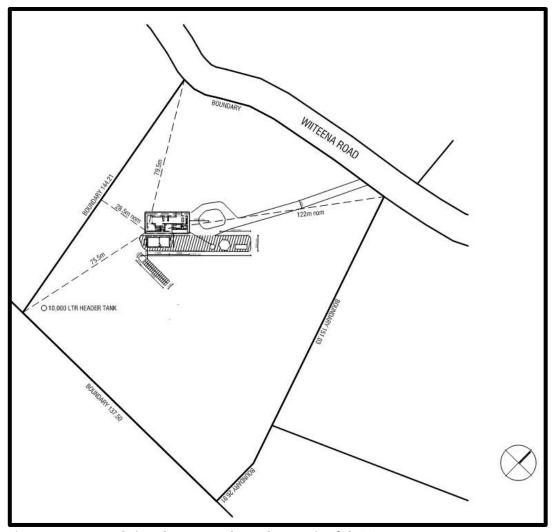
Proposed site plan (strata lot only) (Designful, 2017)
